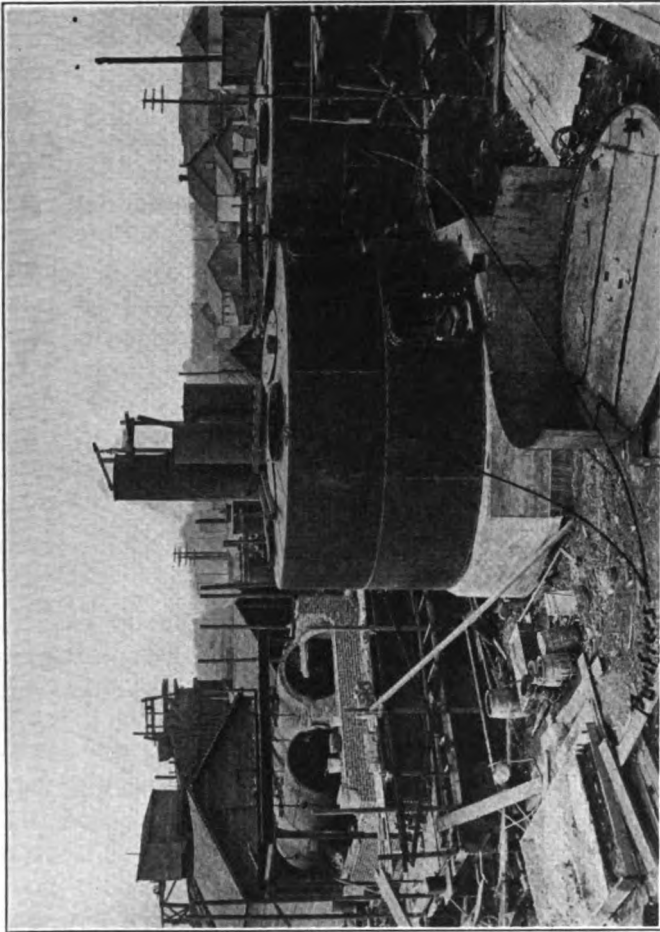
(No. 14-a) Outside steel purifiers under construction. Note openings for emptying and filling boxes.
